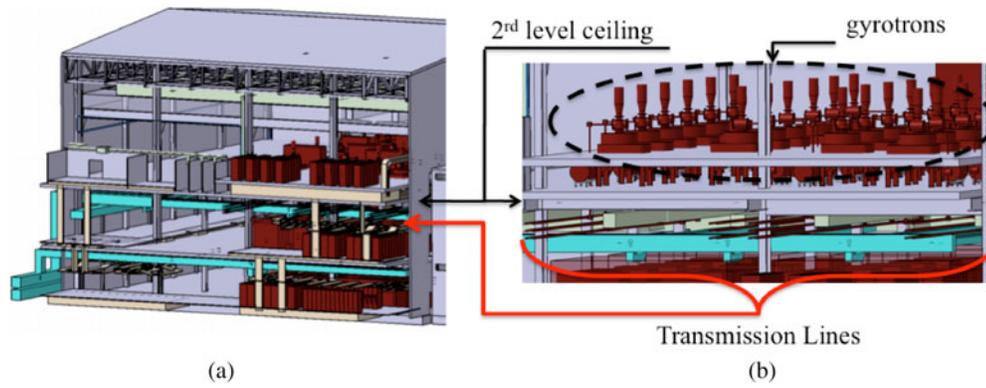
(a) EC components' arrangement in the rf building at the intersection with assembly hall (not showed in the figure) and (b) detail of the TL routing under the ceiling of the second level.
